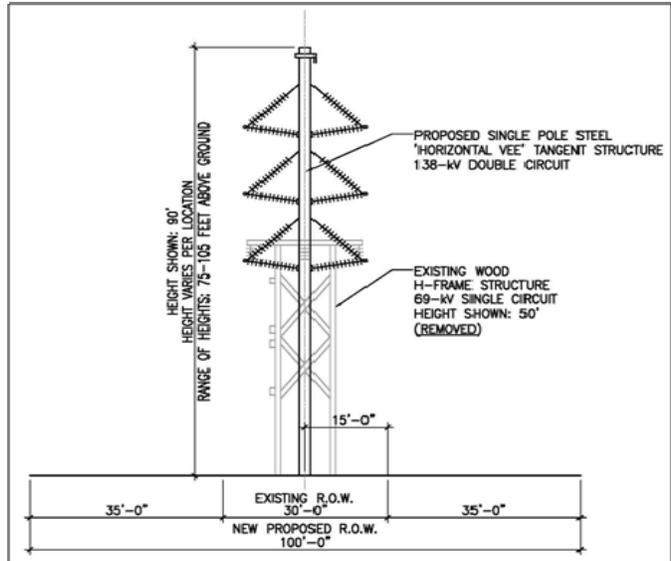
Typical Profile of New Single-Pole Steel Structures on Existing but Expanded ROW.
